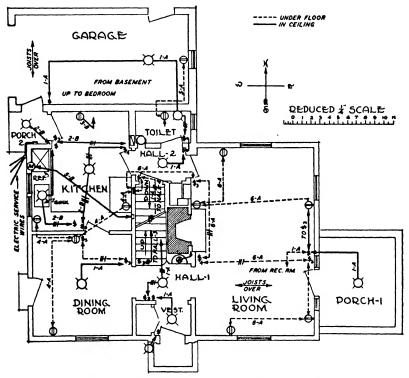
Wiring Plan of First Floor of 11/2-Story Building
